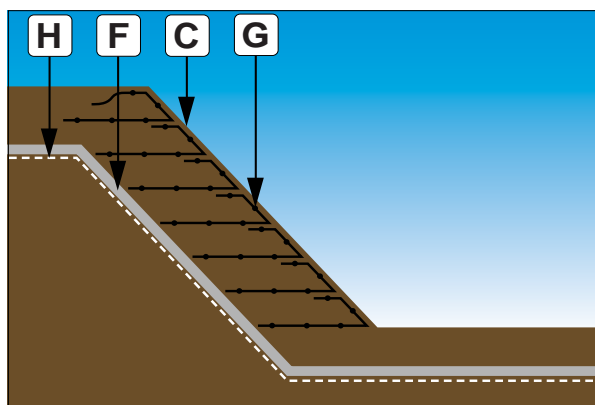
Typical cross-section of a slope cut with the pipeline installed and the geogrids used to reinstate the original geometry.
